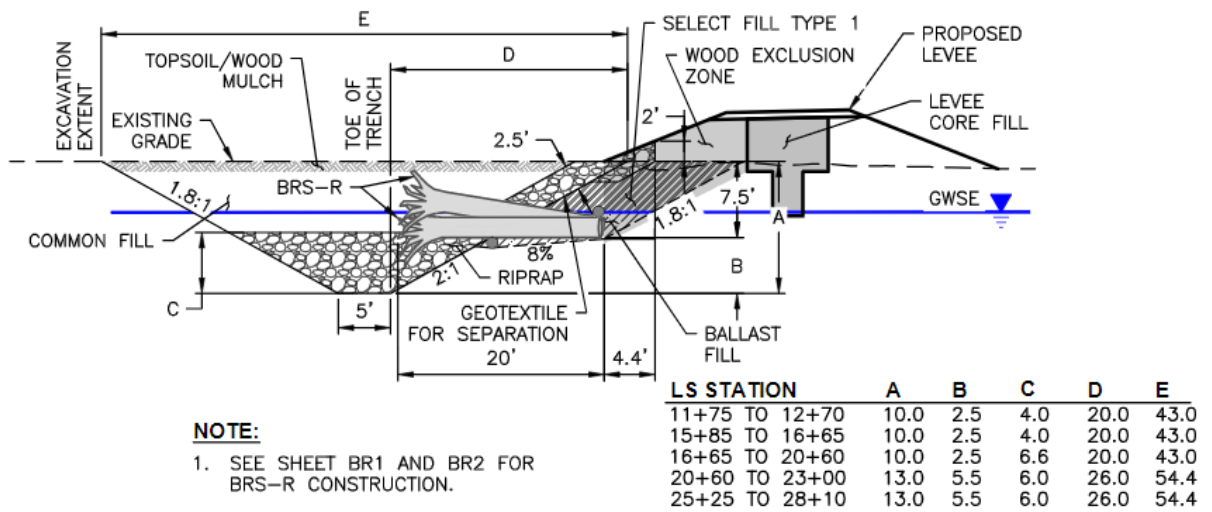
Figure E. Typical Biorevetment Geometry, Sections C-C' through D-D'
